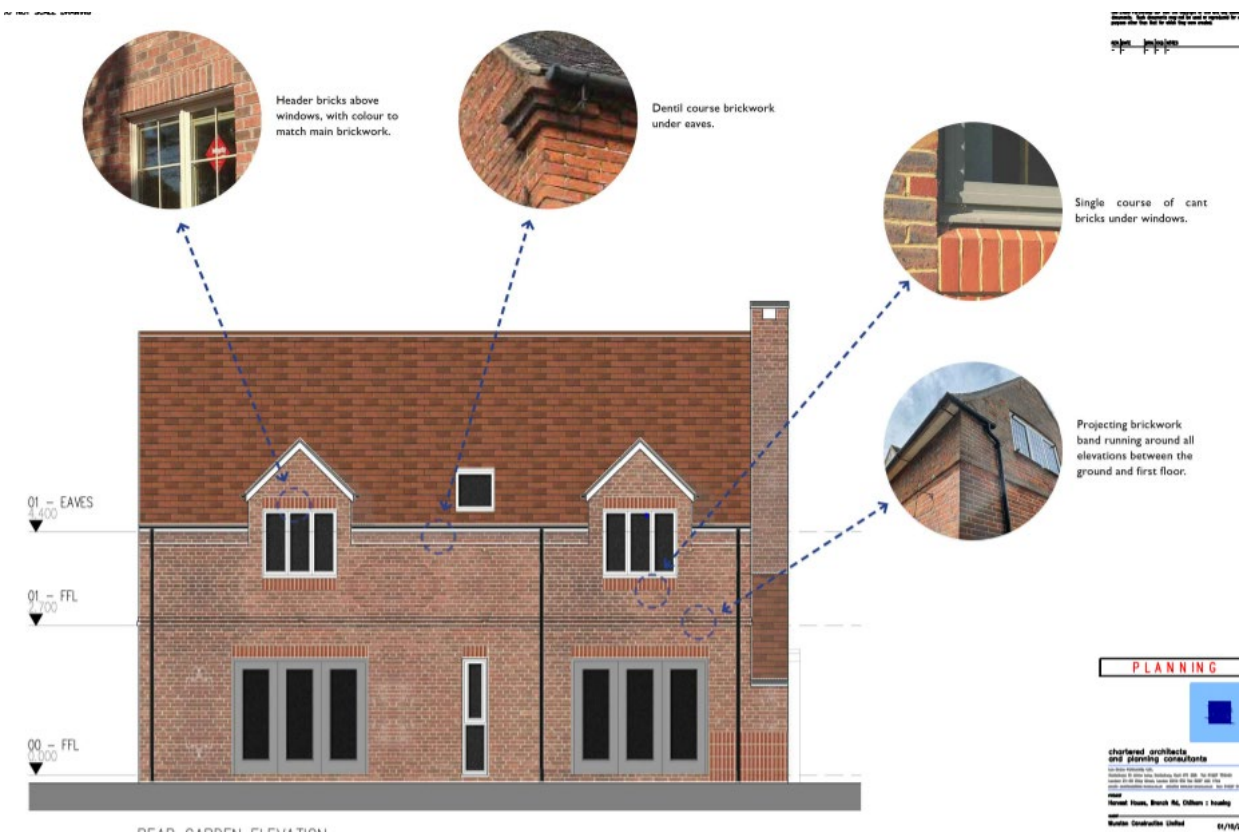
Terrace of four showing dentil course to eaves; projecting band course and cant brickwork under windows and leaders above windows.
